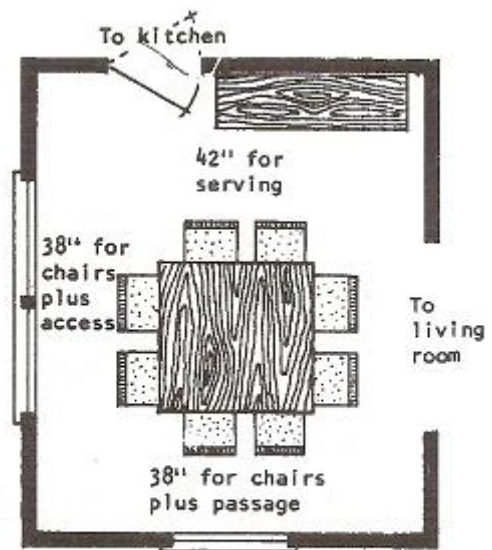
Dining room, eight persons, four-bedroom living unit.
